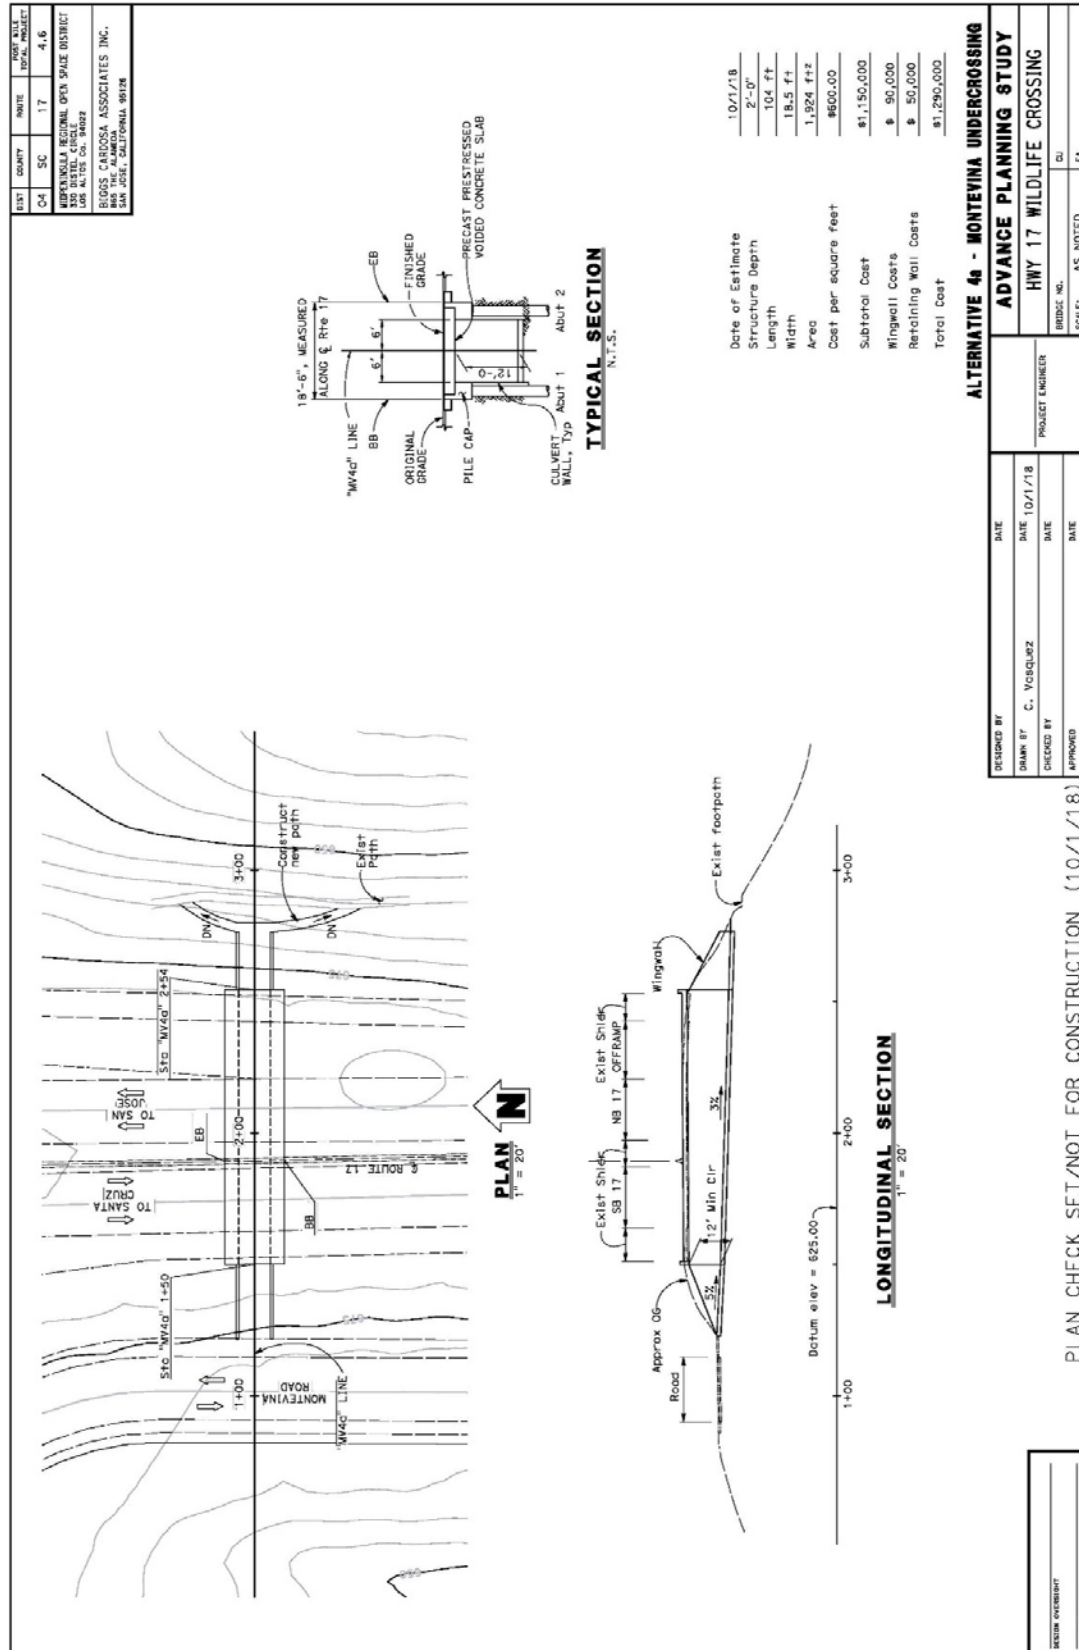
Conceptual Engineered Plan - Alt. 4a, Montevina Trail Only Undercrossing
